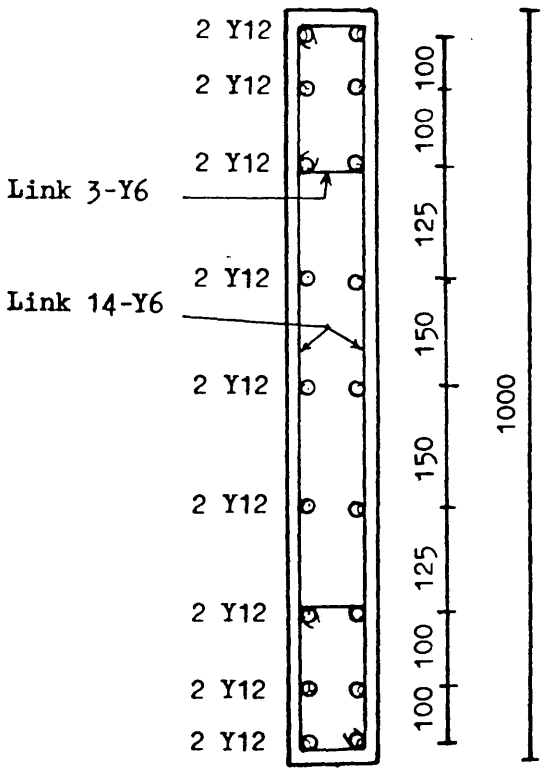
A horizontal section in the wall of model MS9 showing the reinforcing details
